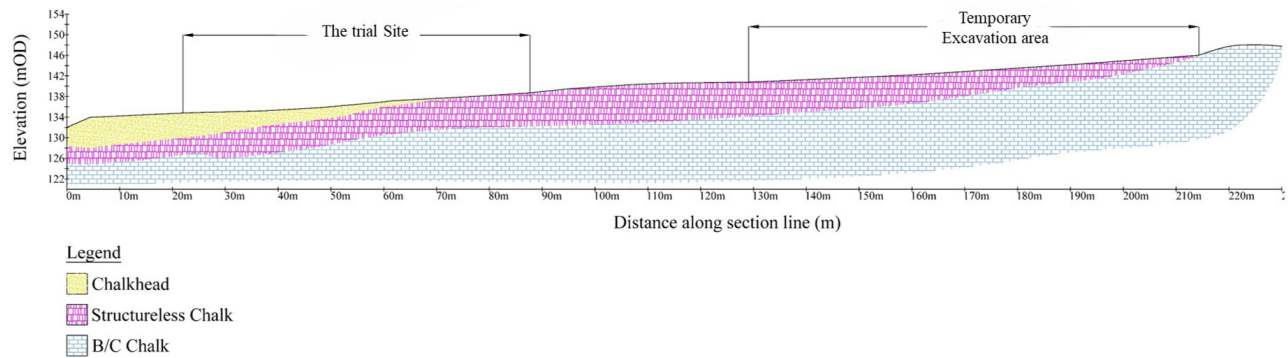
A longitudinal section showing the ground profile at the temporary excavation area and the trial site.
